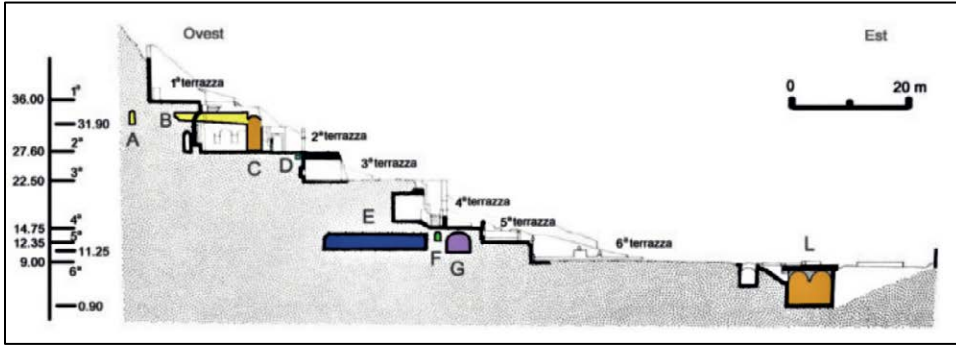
Baiae: Thermal Bath Archaeological Park. 'Villa dell'Ambulatio' plan: hydraulic structures levels (adapted from Miniero et al. 2022).
